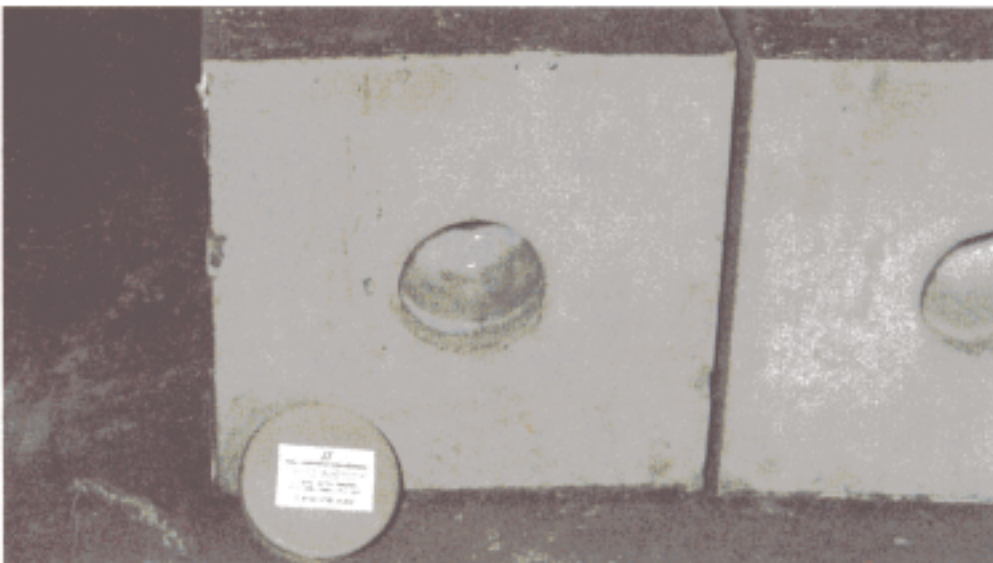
Test Block with Plastic Connector Sleeve (High Concrete Accessories)
